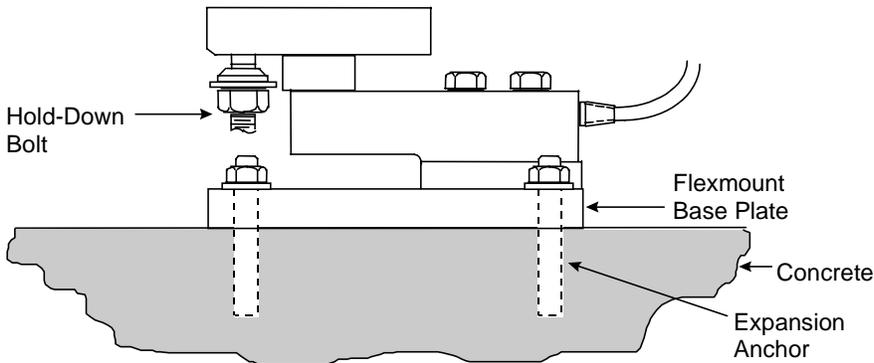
Base Plate Bolted to Level Concrete Floor
